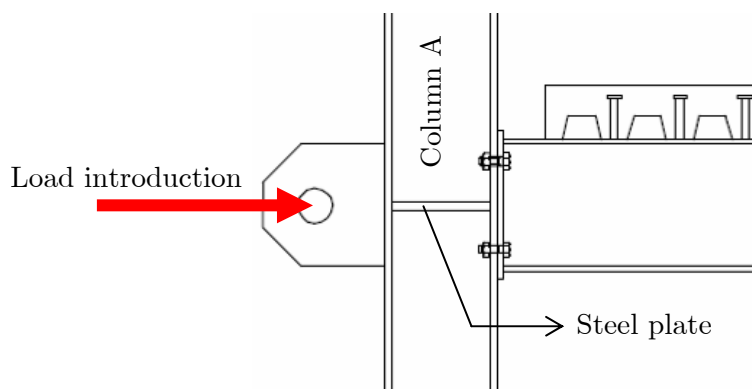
Steel plate at the single-sided joints between column A and the beams
